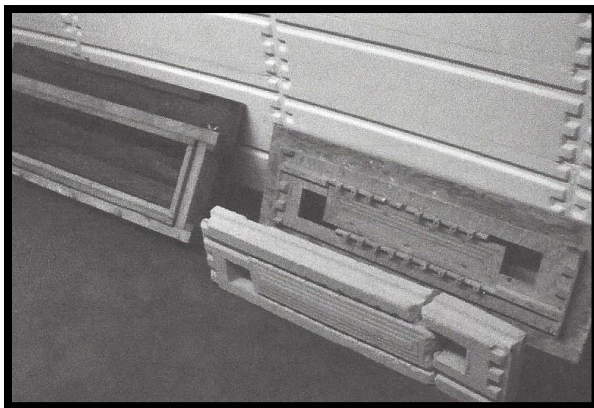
Example of a textile block and the mold from which it was formed. Florida Southern College.
